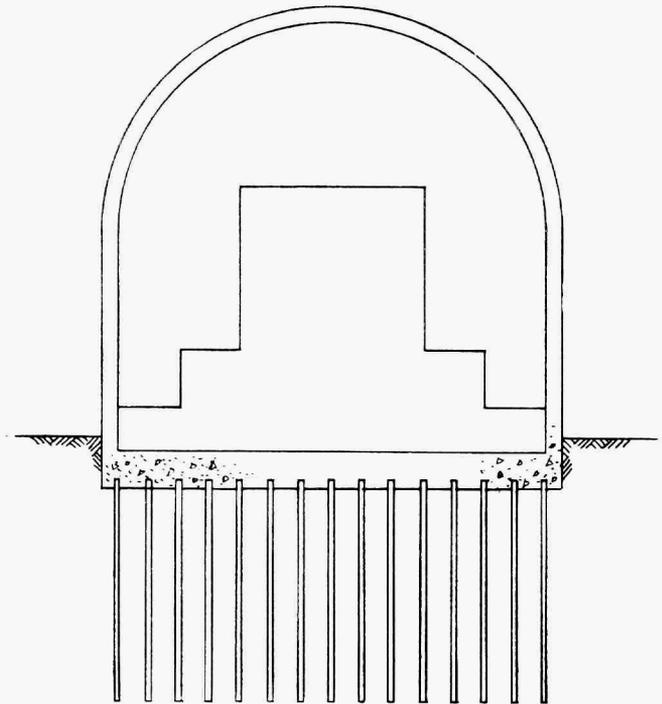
Flat-Bottom Containment Structure on a Pile Foundation.
